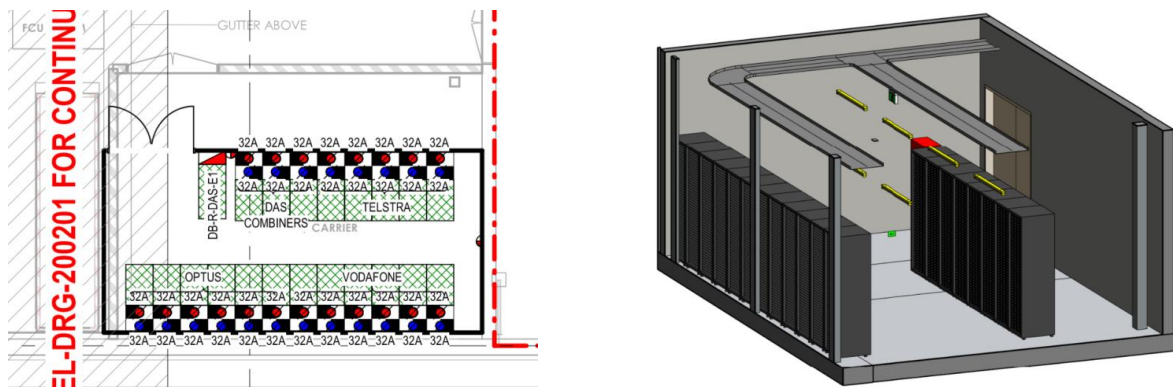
Proposed location of the new DAS/Carrier Room within the New Build
